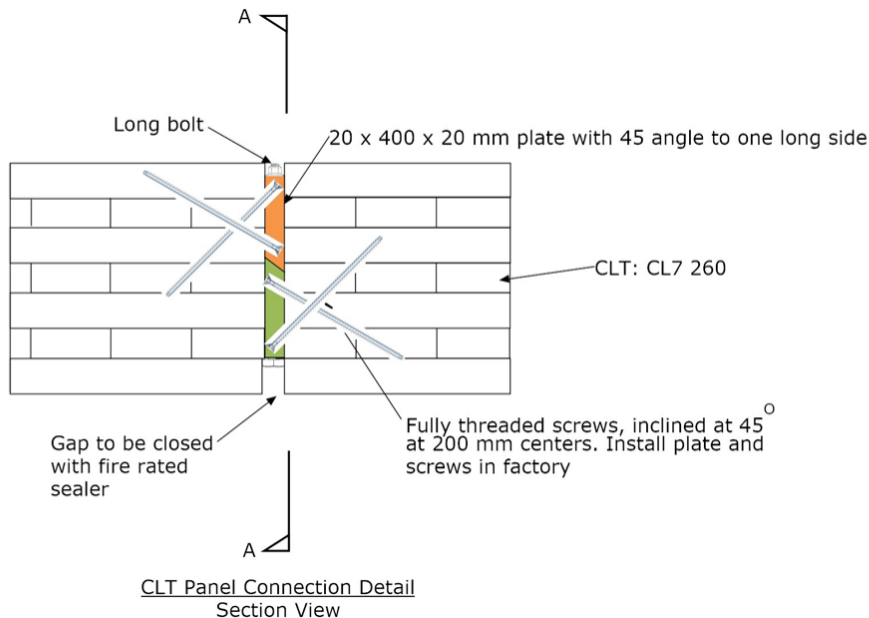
Mechanical Connection using Metal Plates and Screw and Bolt Fixed
